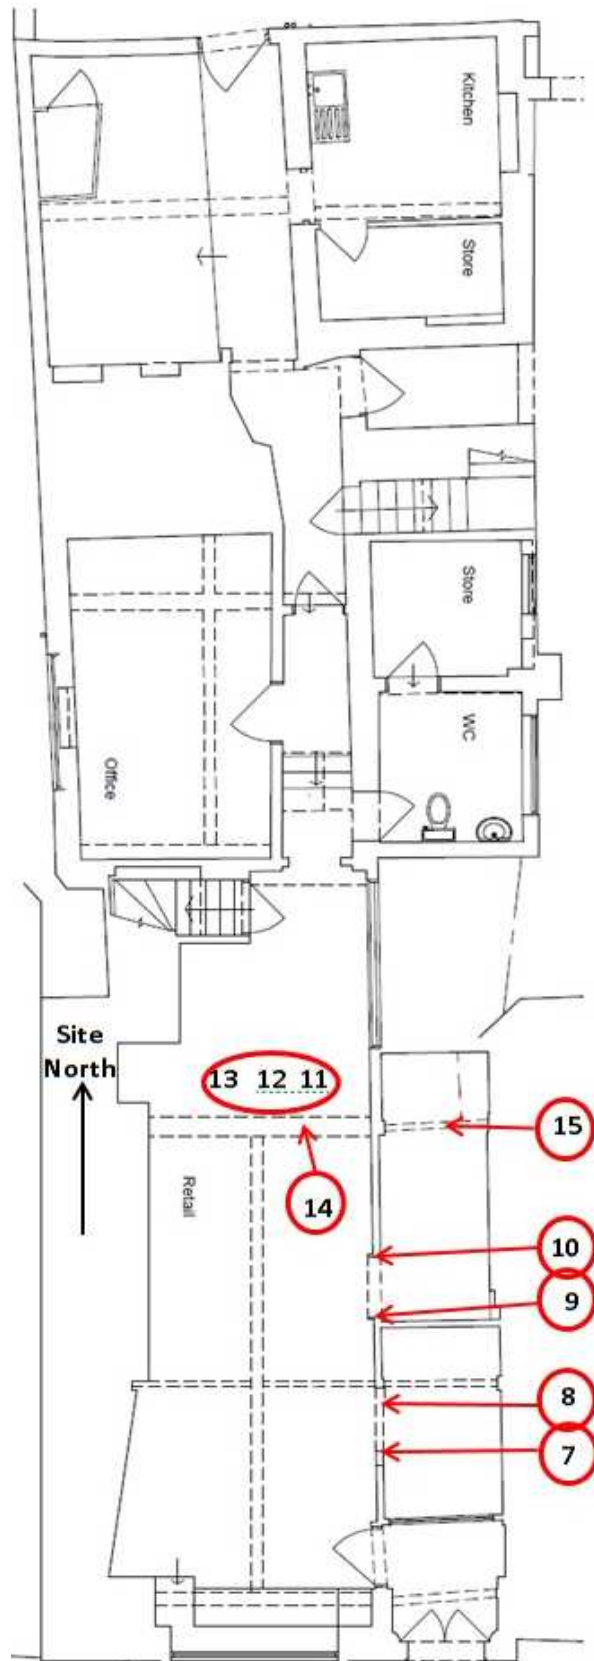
Plan to locate sampled ground-floor timbers (after Nick Joyce Architects)
